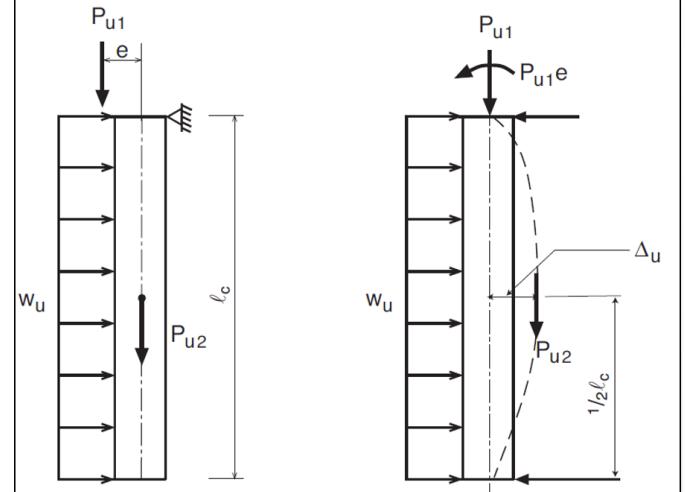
Wall Structural Analysis According to the Alternative Design of Slender Walls Method (PCA Notes)
